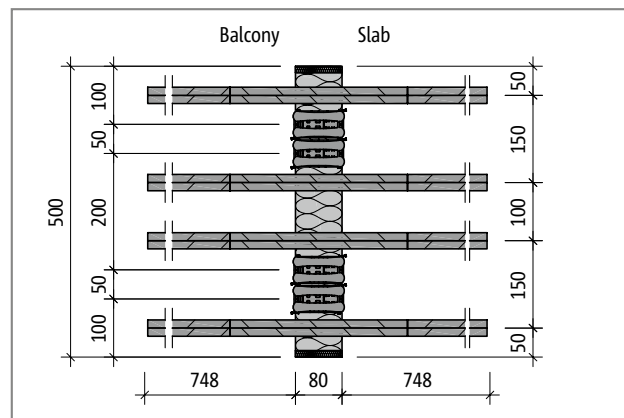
Schöck Isokorb® T type Q-E-VV7: Product layout
